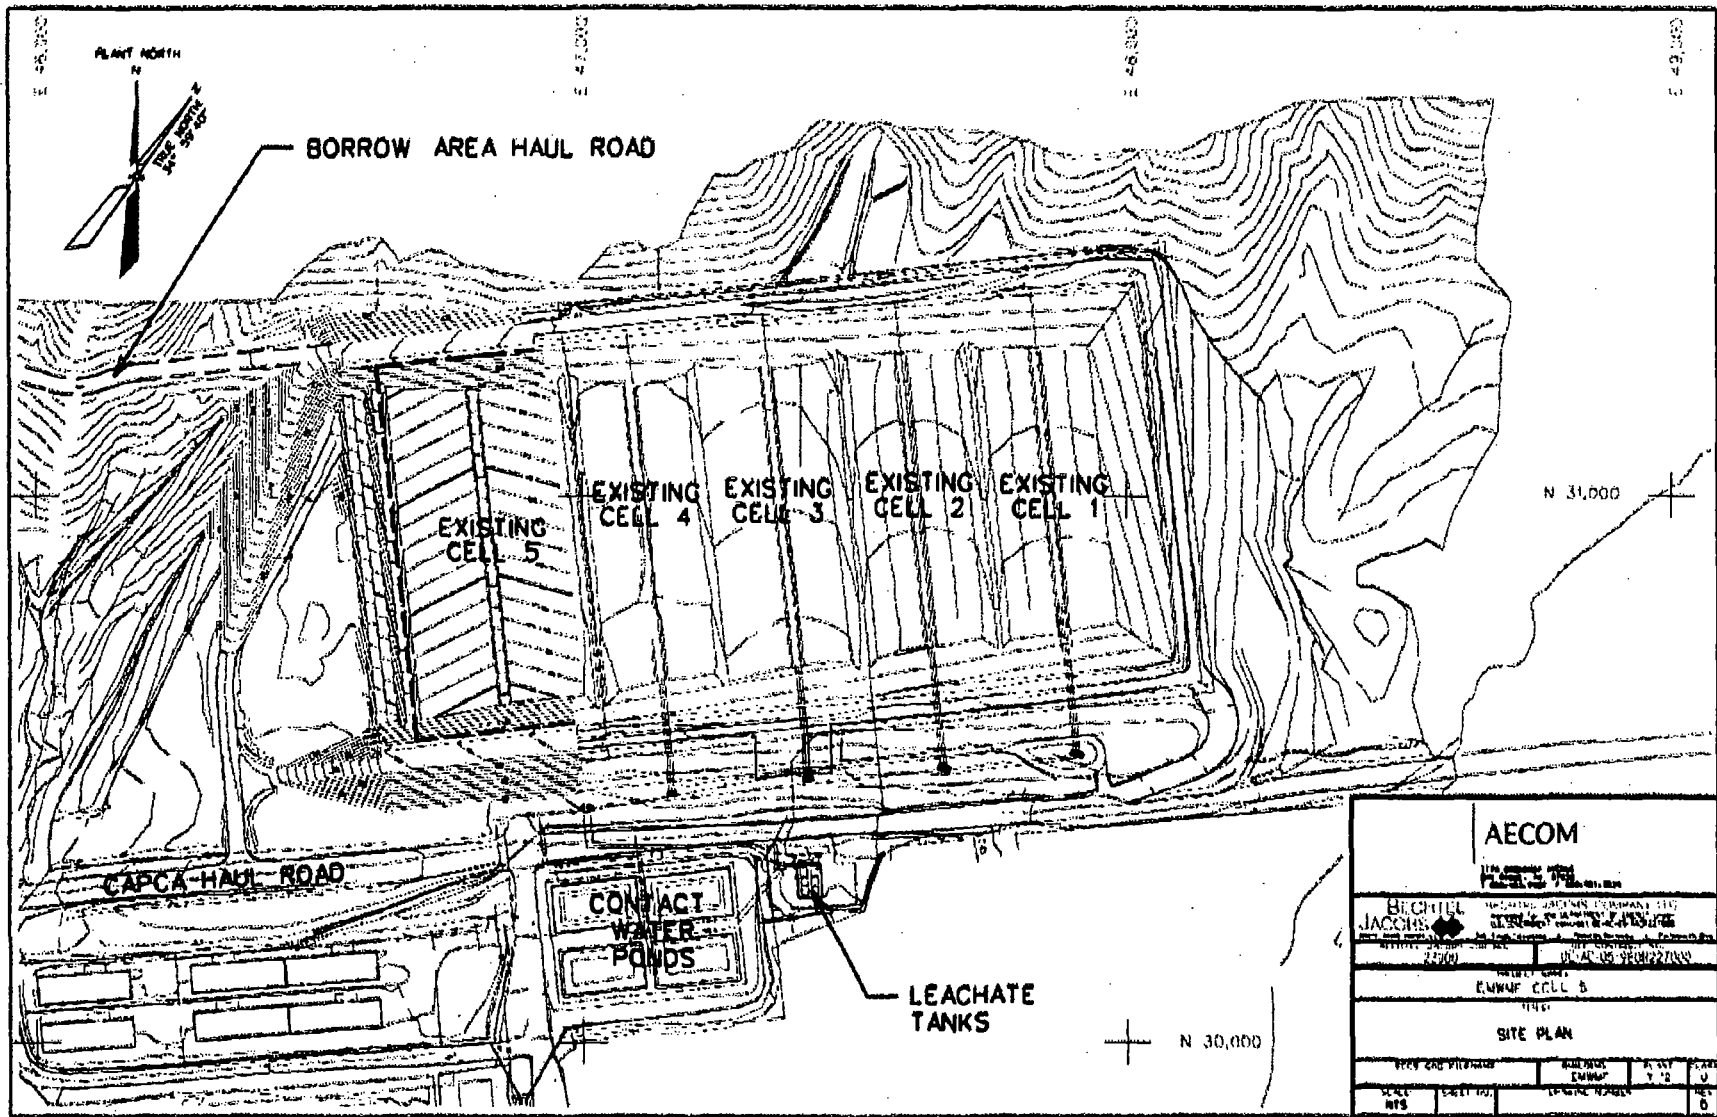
EMWMF Design Plan – Existing Cells 1-4 & New Cell 5 Currently Under Construction.
